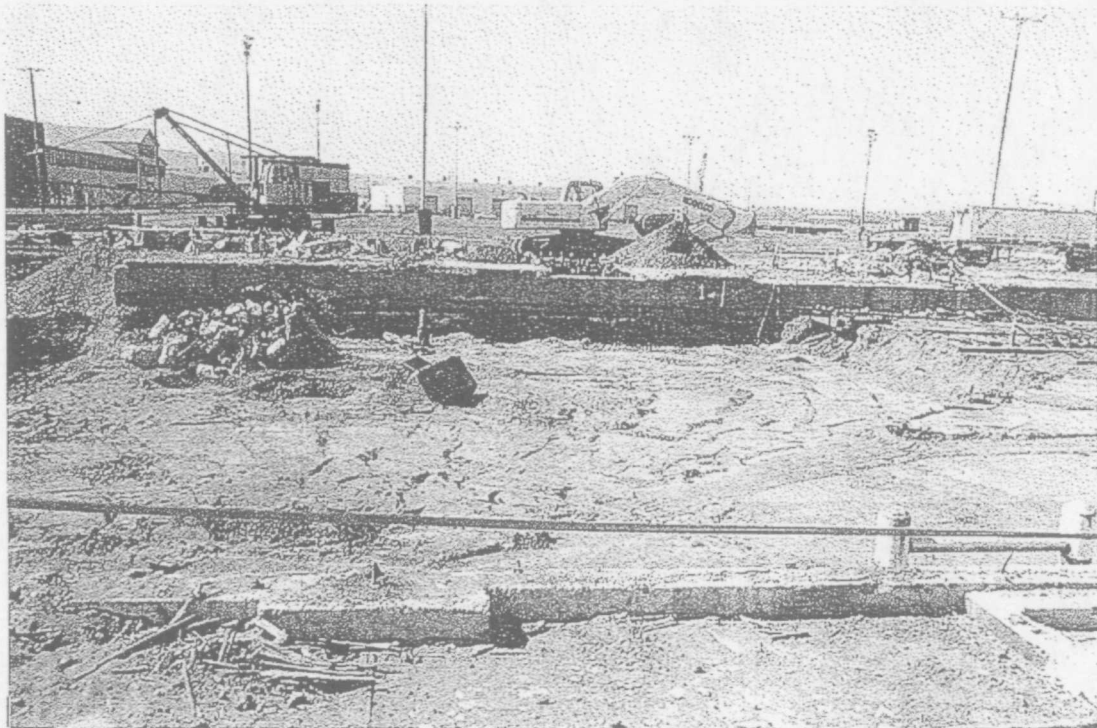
Areas 2 and 3 excavation, shoring along Front Avenue in the background (looking west).
